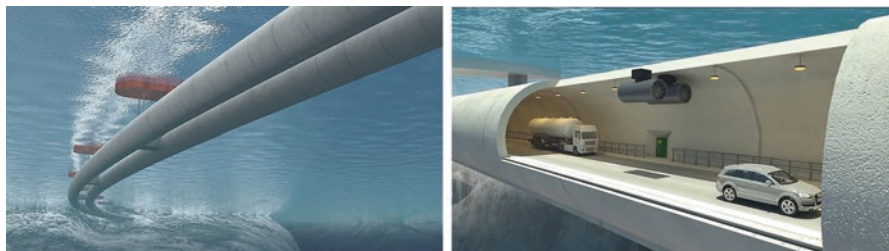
Example of a submerged tunnel concept (Source: Norwegian Public Road Authorities)
